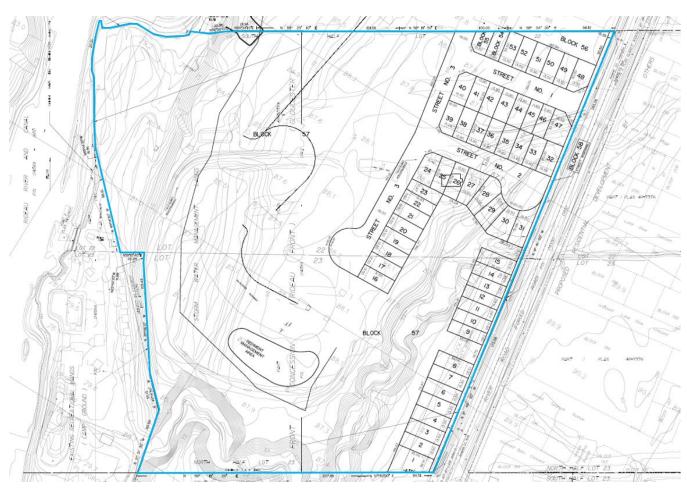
Proposed Draft Plan of Subdivision for the subject property
